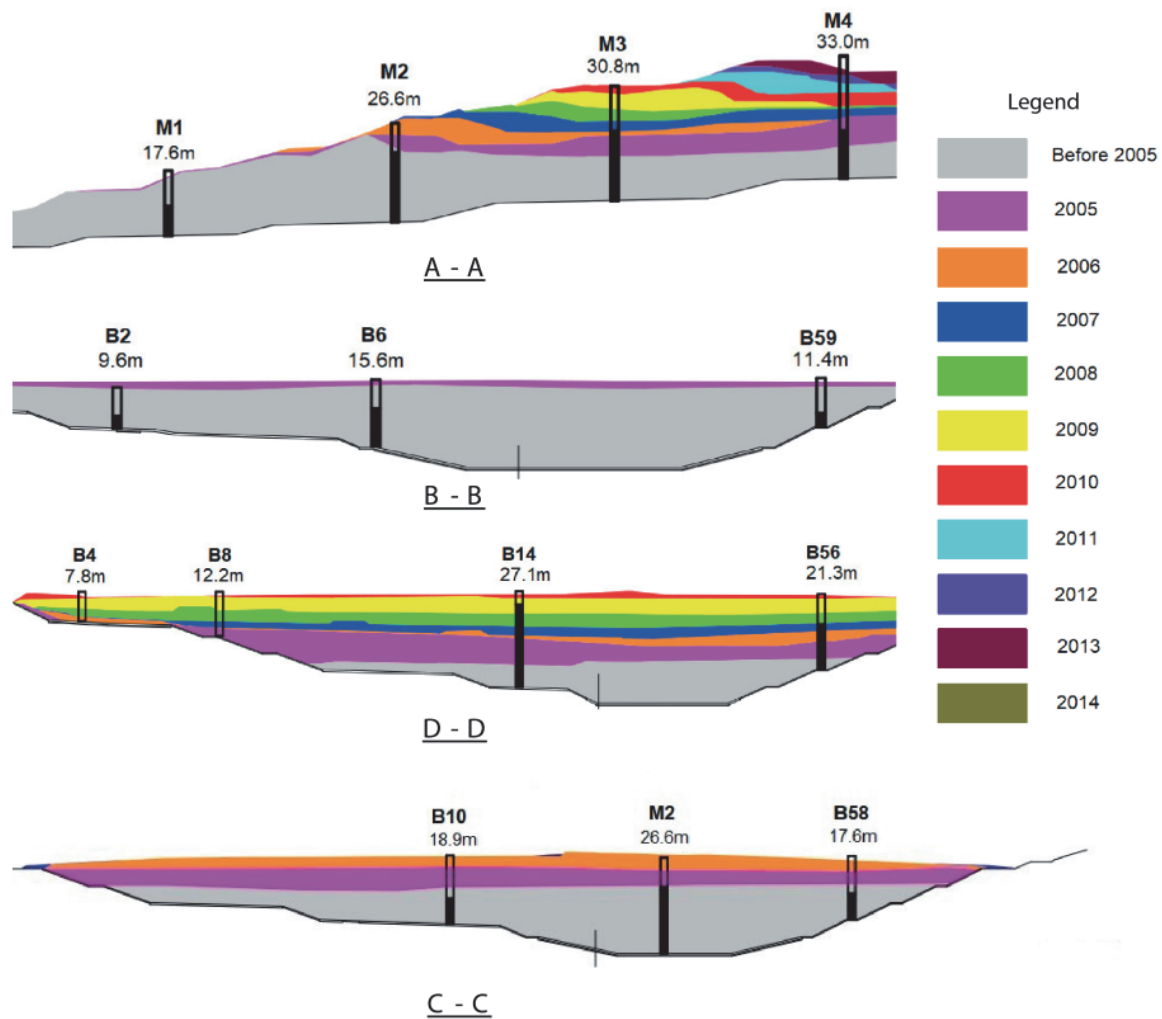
Cross-section of waste layers through the landfill gas venting pipes.
